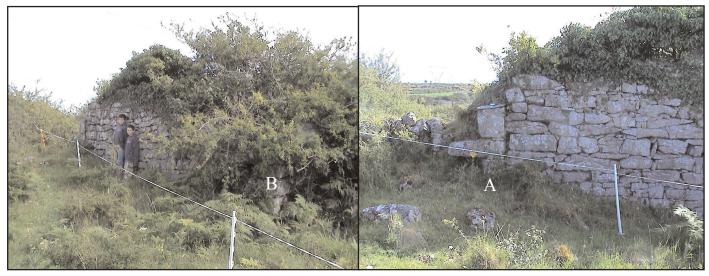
Building gable wall section, infilling between two remnant wall sections constructed of very finely dressed limestone: Pillar A, on the left, east side; Pillar B on the right, west side, and partially obscured by bushes.
